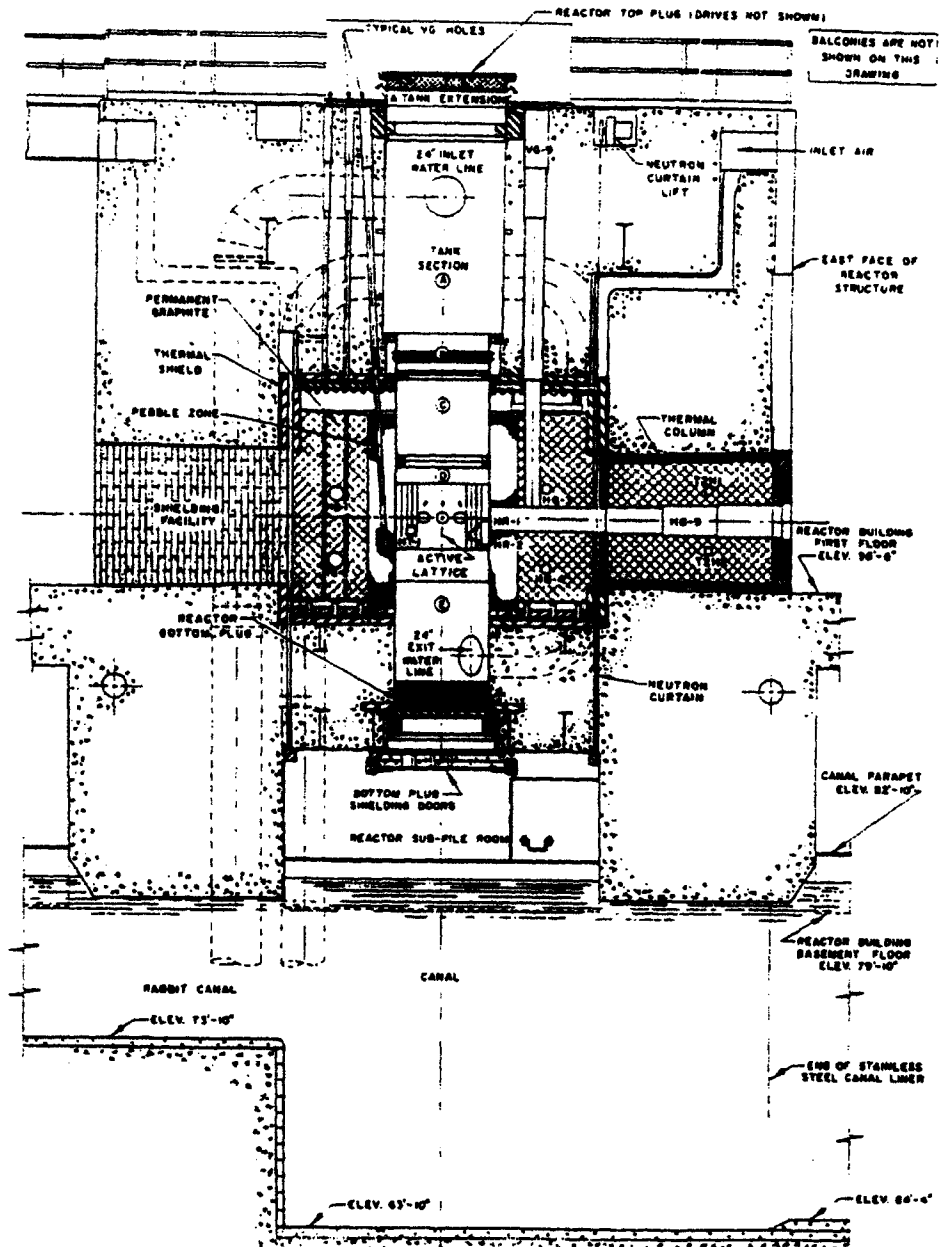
Cross section of MTR structure as viewed from the south at east-west center plane.
